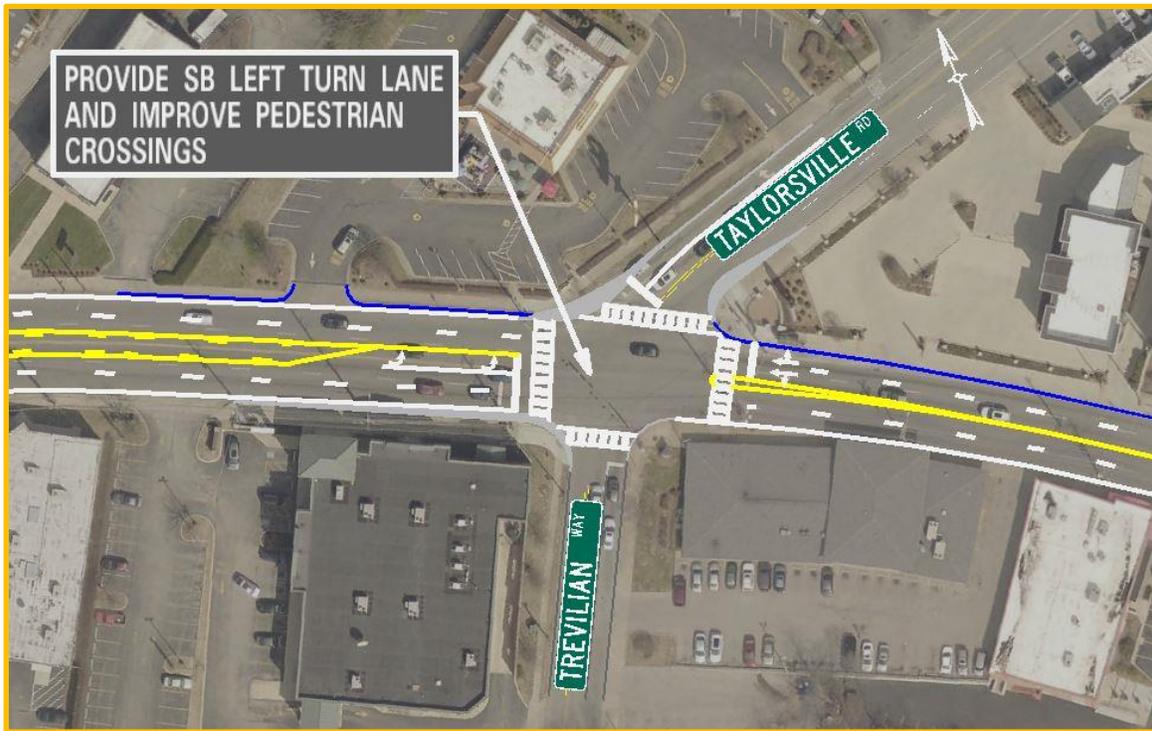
Bardstown Road at Taylorsville Road/Trevilian Way—Proposed Configuration
